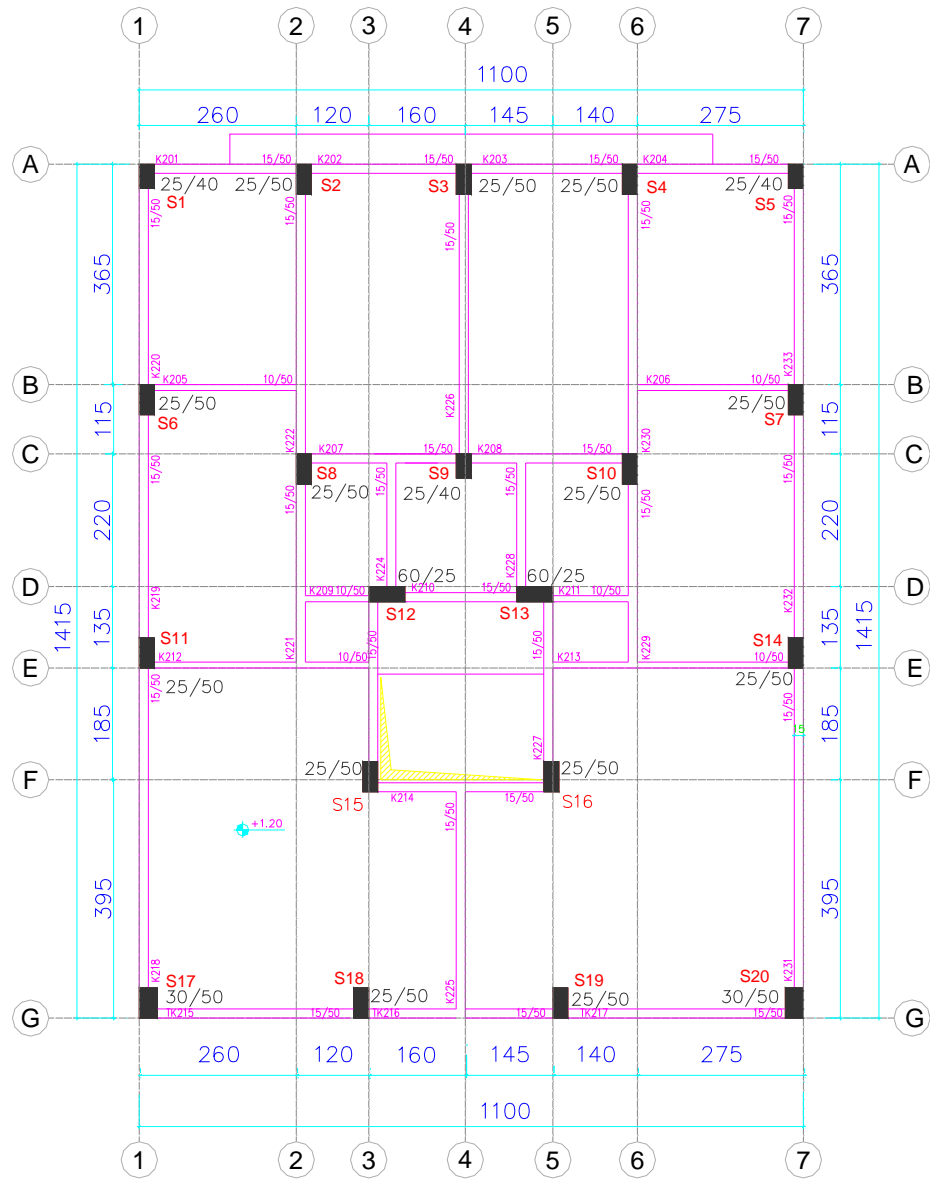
Original ground-story floor plan of a building located in Bakırköy, İstanbul
